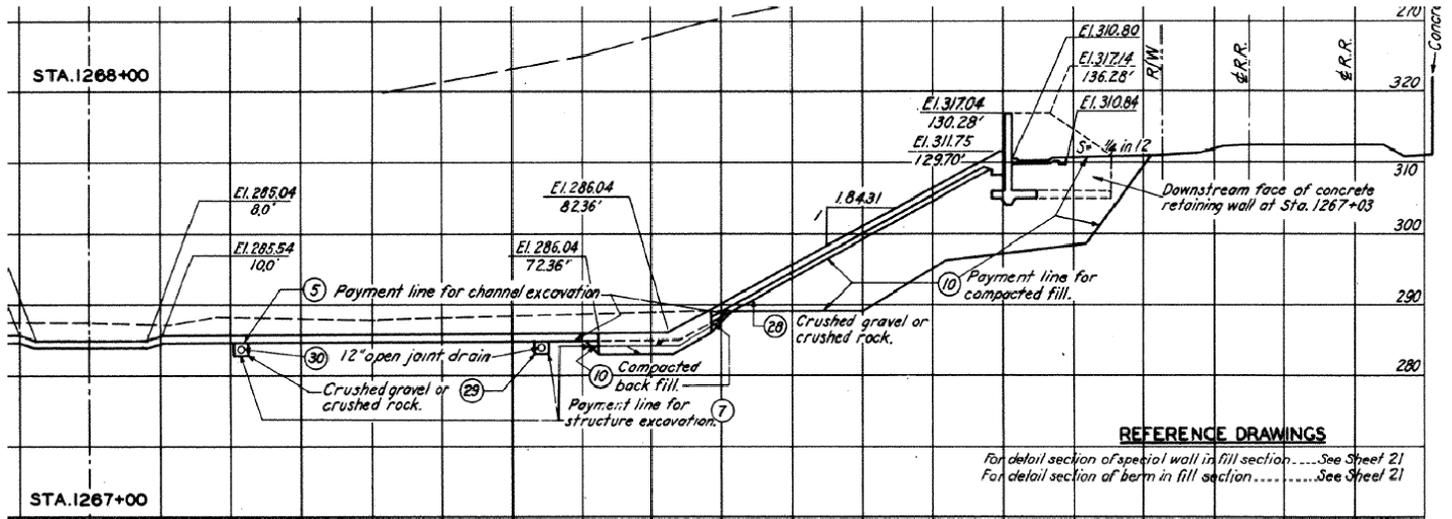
Los Angeles River Left Bank Cross-Section (Looking Upstream At Station 1267+00 [District File No. 303/13])
